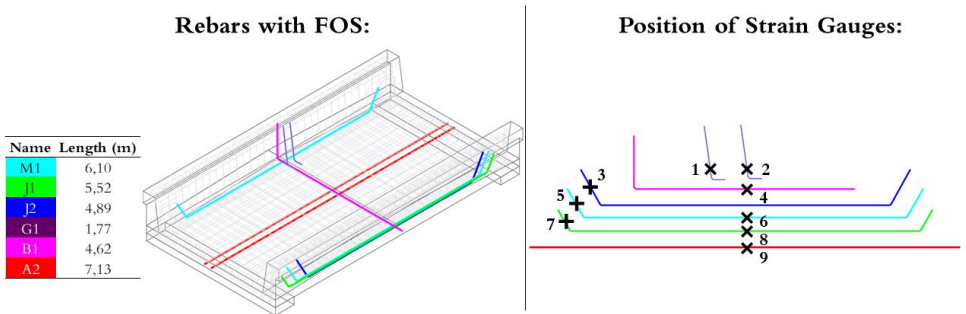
Trough bridge instrumentation: rebar instrumentation with FOS (left) and position of strain gauges in these rebar (right).
